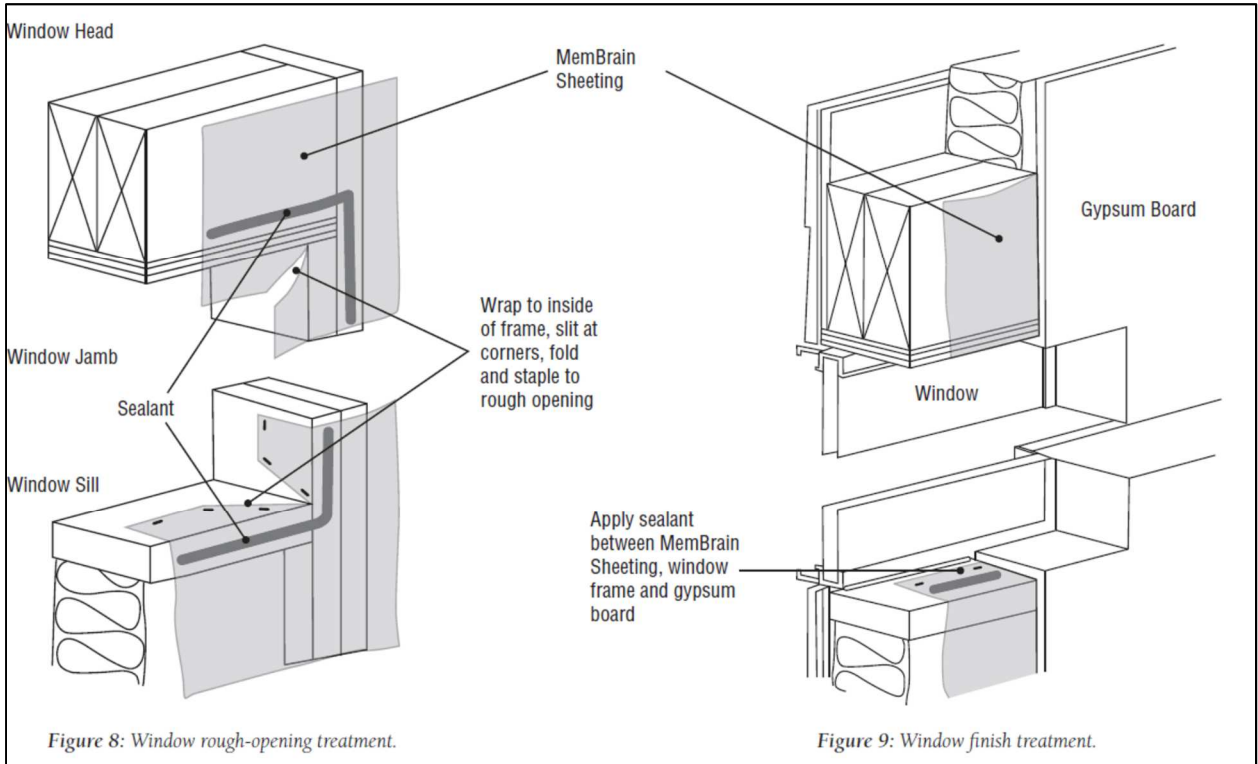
Typical sealing and MemBrain attachment method around window rough opening
